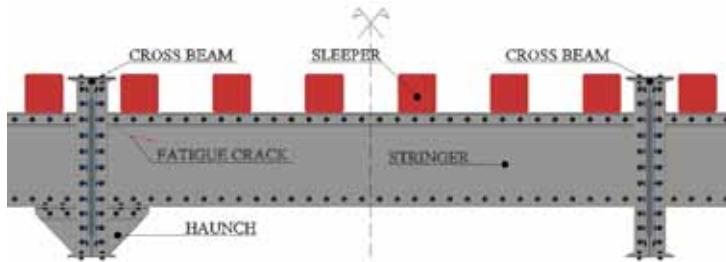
Fatigue crack and arrangement of a typical stringer to cross beam connection with/without reinforcing haunches
